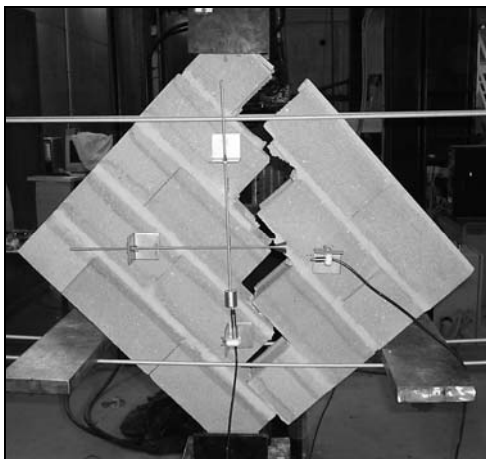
Cracking pattern on specimens built with 3C-units.
